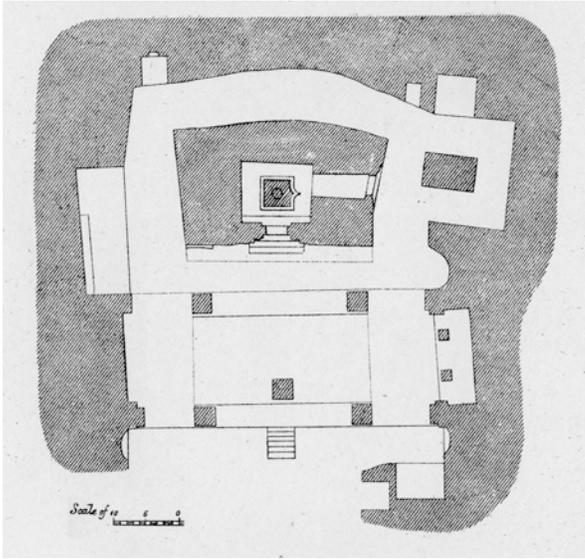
Dhoke, plan of the Śaiva cave (Burgess 1888).
